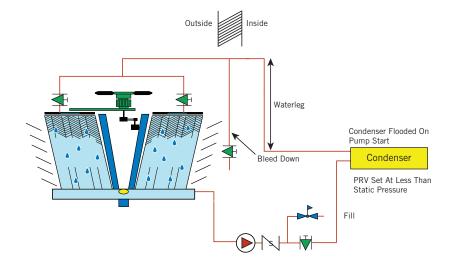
Check, Water Leg and Fill Prevent Piping to Tower Drainage - RIGHT
